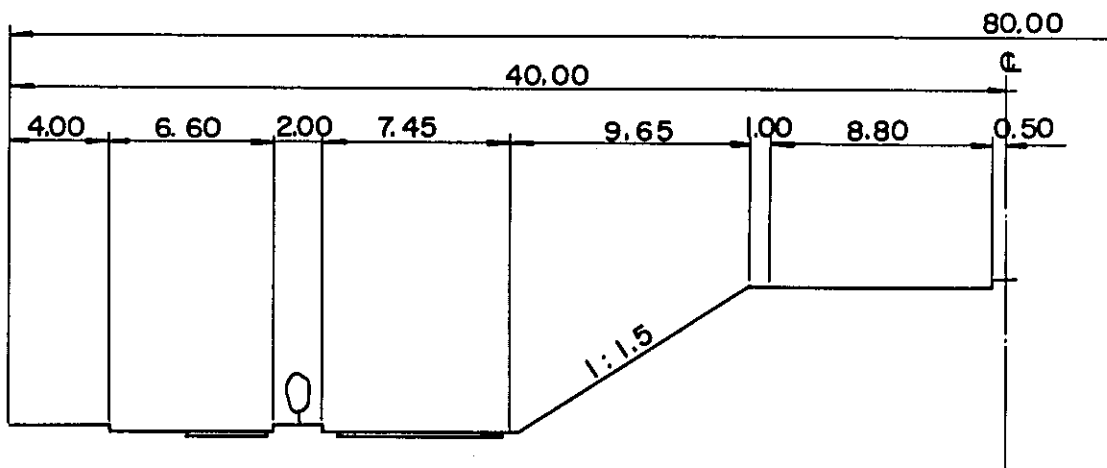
ROADWAY CROSS SECTIONS
